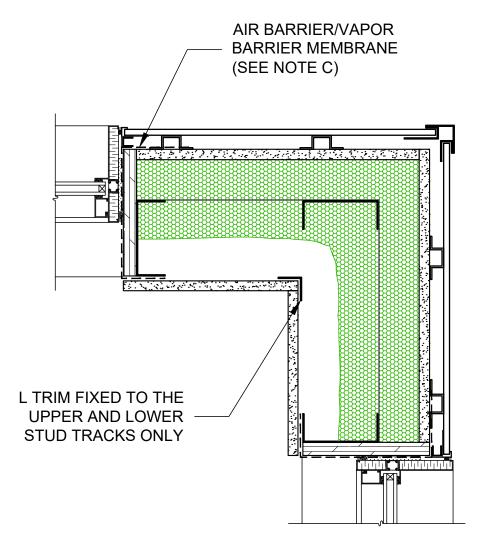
DETAIL AT WALL PENETRATION LIGHTWEIGHT SIDING
